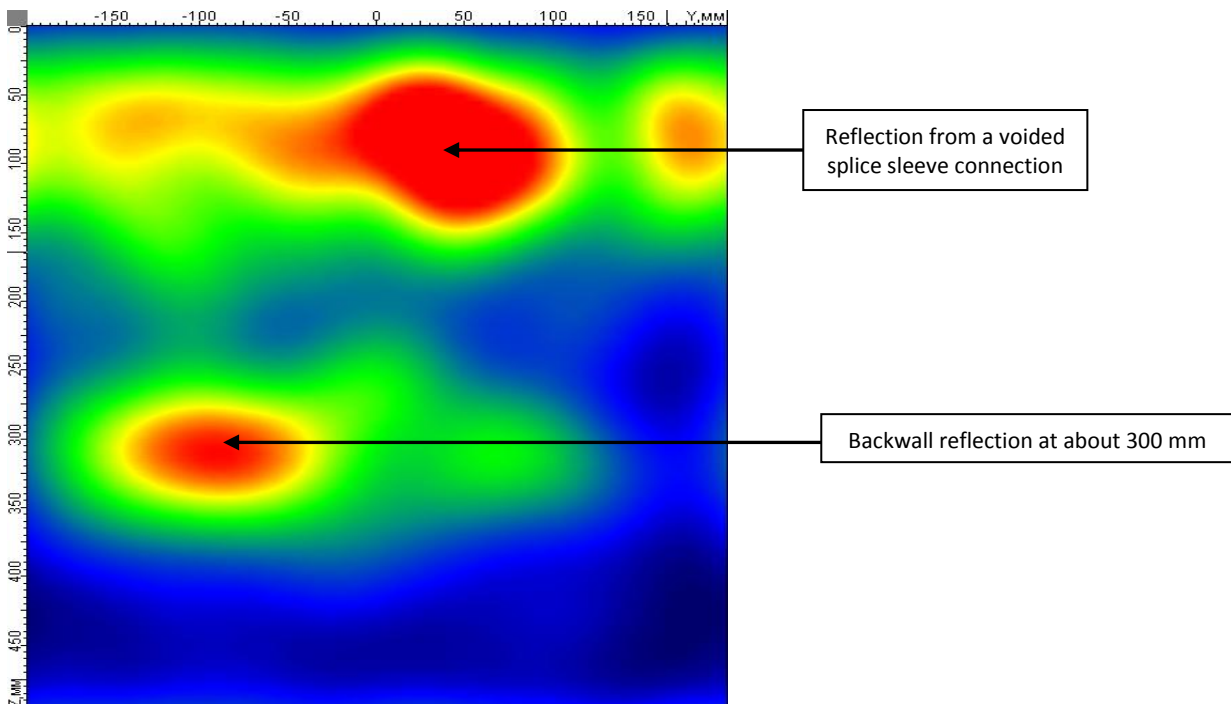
View of *MIRA* test result showing a voided wall panel splice sleeve connection and the backwall reflection at about 300 mm
